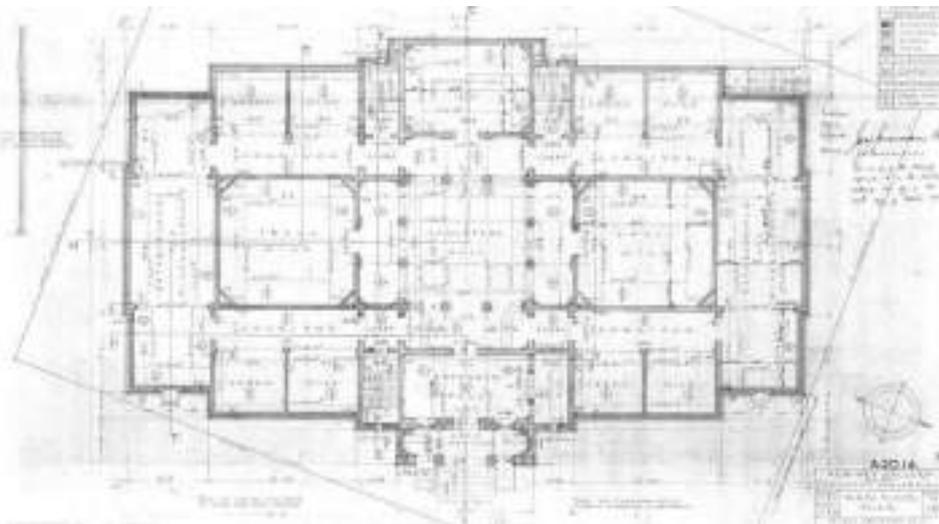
Main floor plan of the Robert McDougall Art Gallery, 1930
